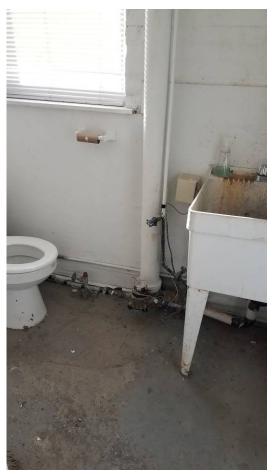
View of first floor bathroom, vertical sewer line from second floor Should you have any questions, please feel free to call me at 845-440-6926.
